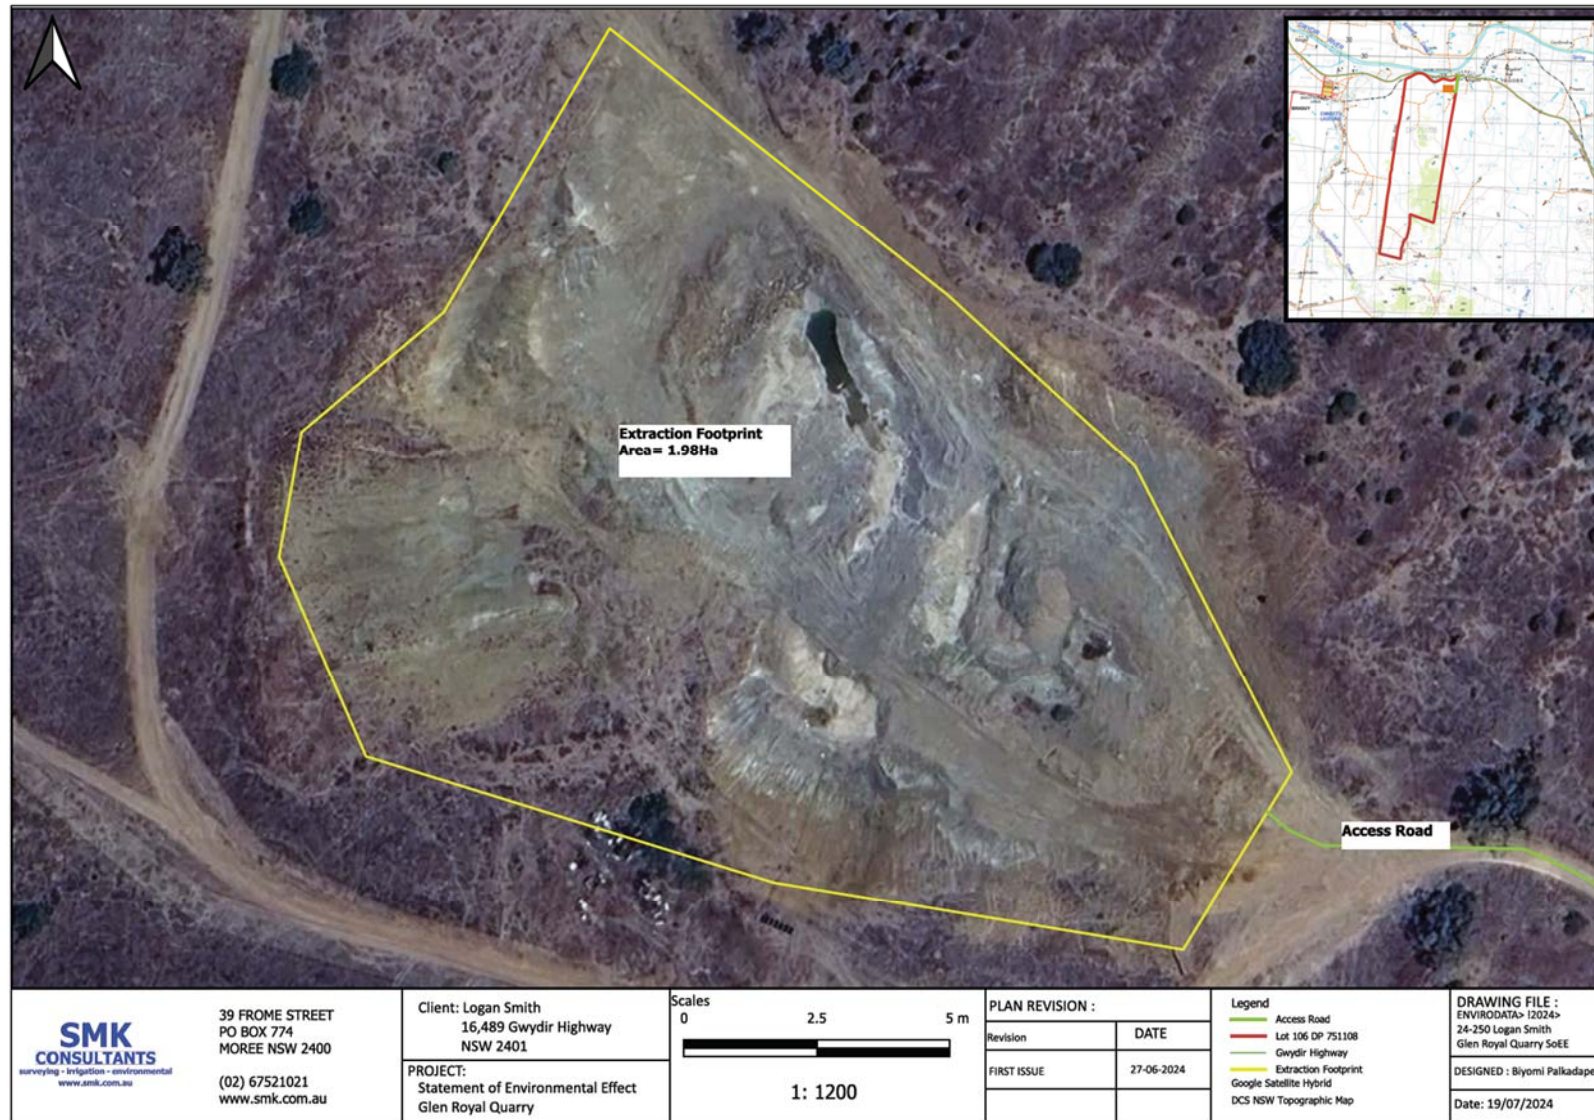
Proposed Development – Glen Loyal Quarry Footprint and Site Plan
